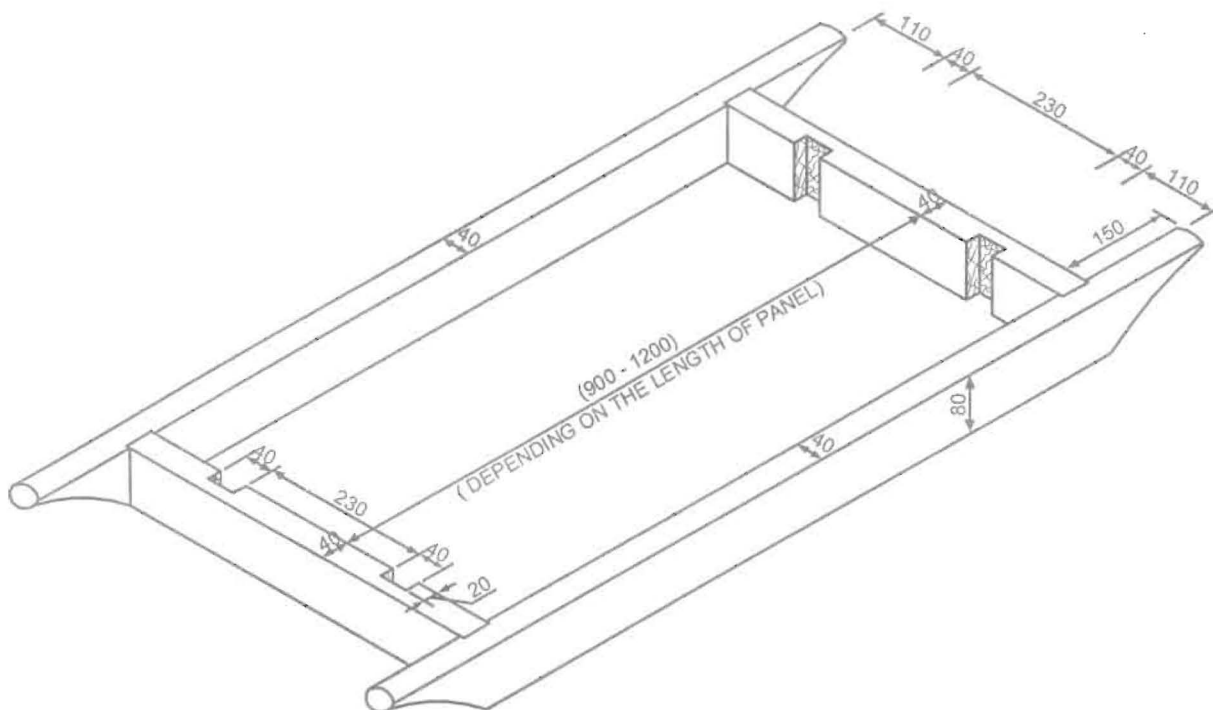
MOULD FOR PREFAB BRICK PANELS
